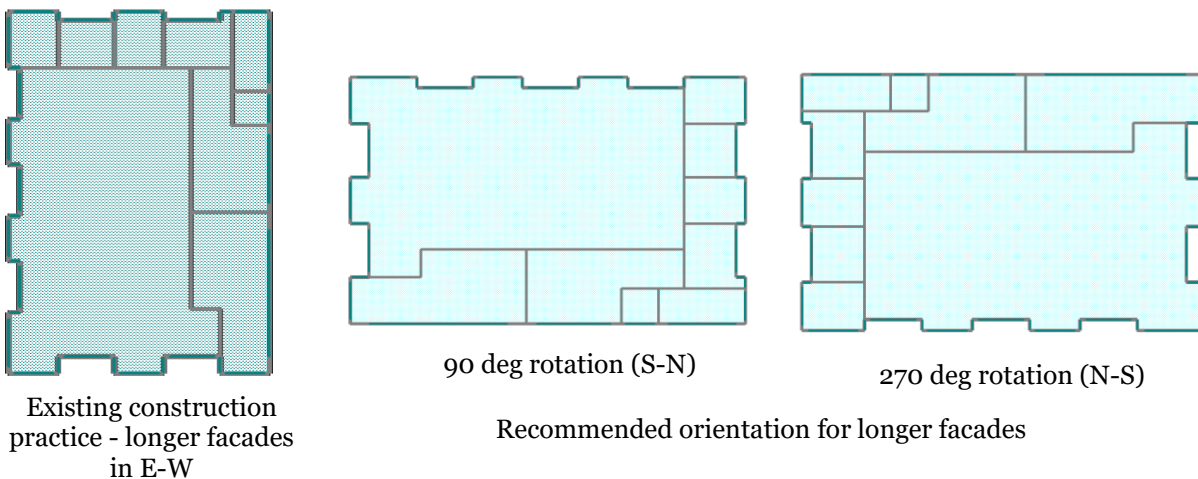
Image showing existing and recommended orientation of longer façade of building in Maldives
